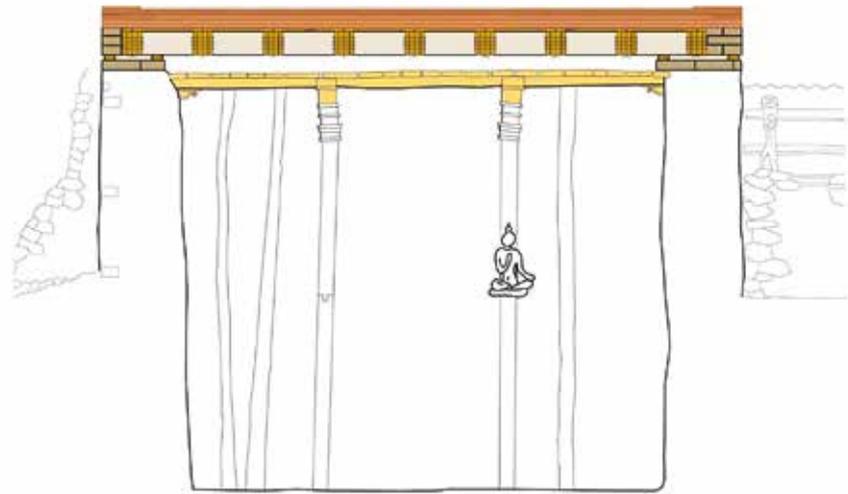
Strategy for the structural conservation of the Lhakhang Gongma: historically painted structural members consolidated and conserved, don't act as load bearing members any more (yellow); new roof structure comprising of 9 beams and ceiling panels, placed on the wall plates, take the load of the new mud roofing (green); new Adobe blocks with similar composition of soil mix, size and compressive strength as the historic blocks (grey); new mud roof laid in 6 layers, illustrating the reinforcement by layering, composed of *tava* soil, *tua* clay, barley straw, mule/cow dung and water (brown).
